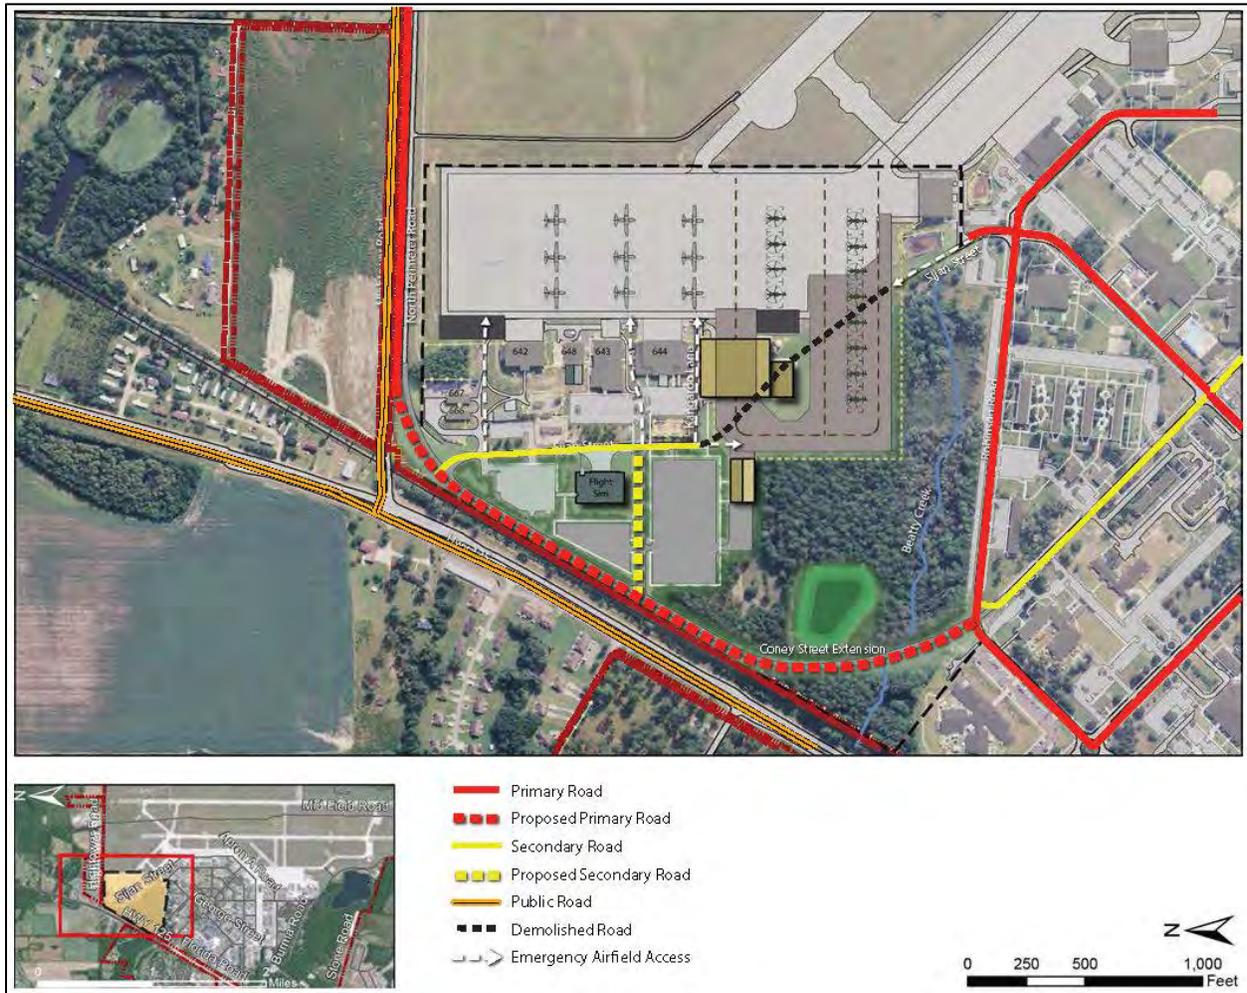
Proposed Alternative 1 (Preferred Alternative) Facility Layout
